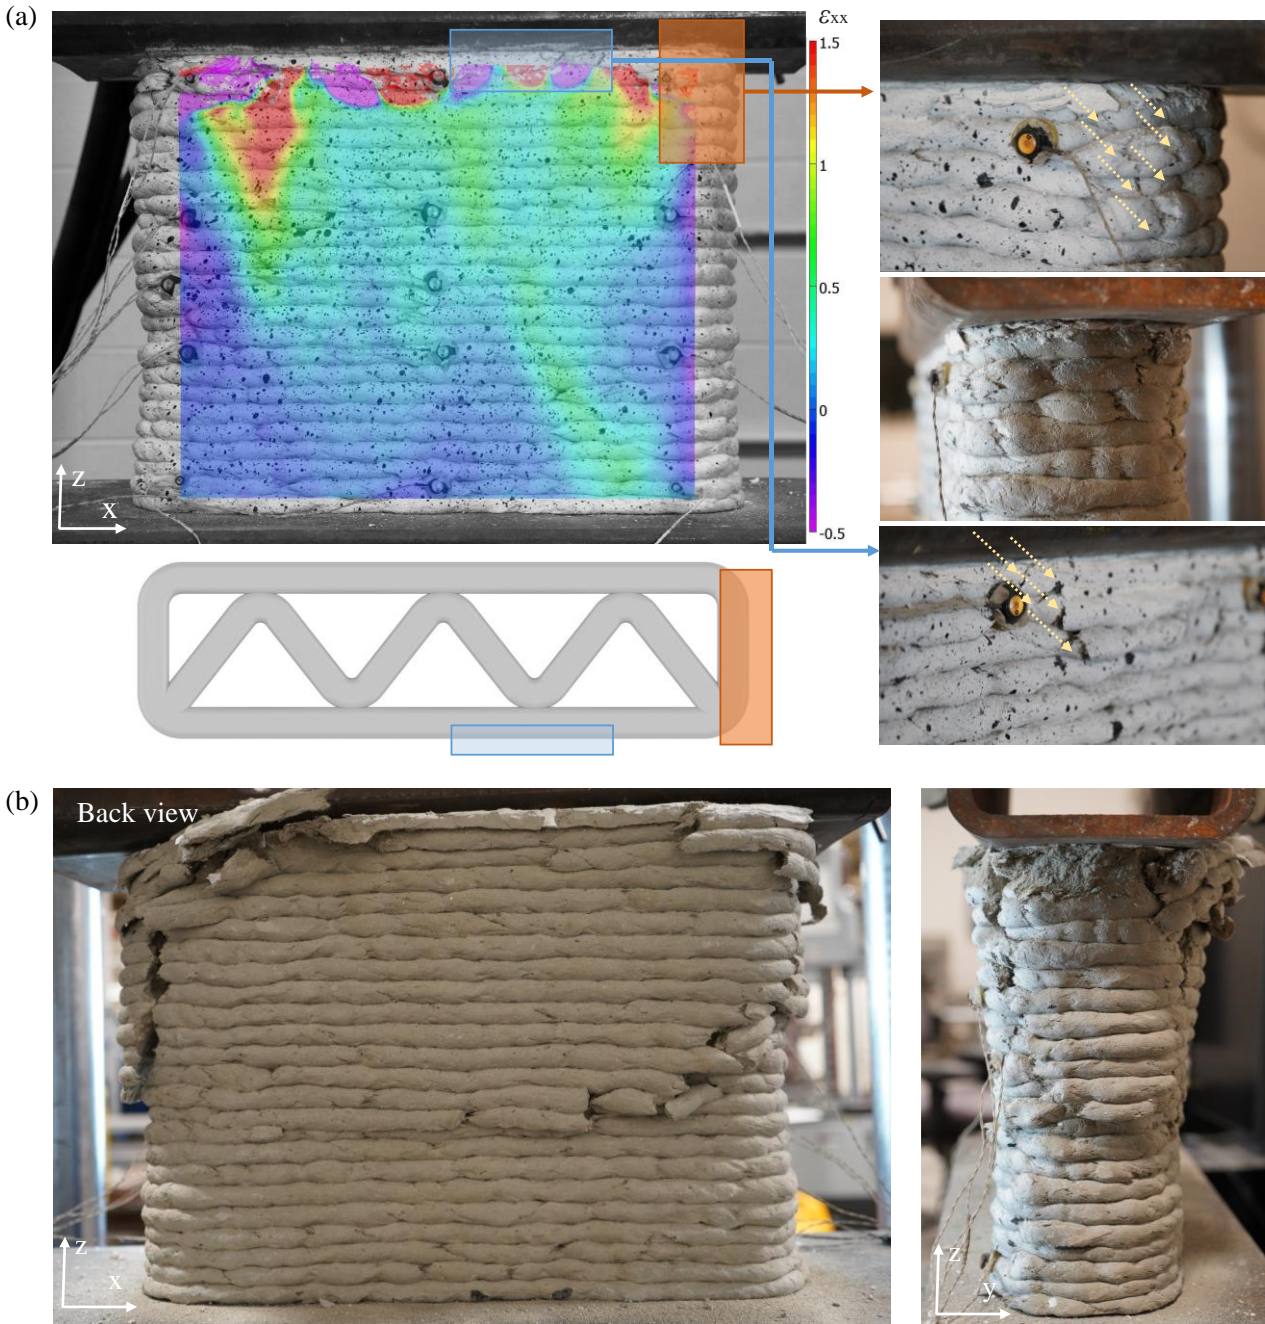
(a) Horizontal strain field and crack pattern and (b) failure mode of TrussB wall under compression.
